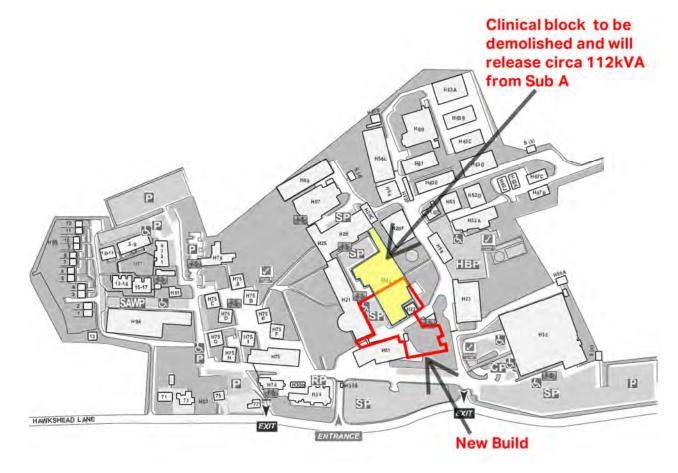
Site Layout showing footprint of new build and H20 South building which will be demolished
